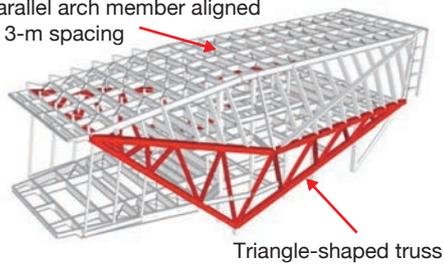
Image of Cultural Building Serving also as Office Tower Entrance
